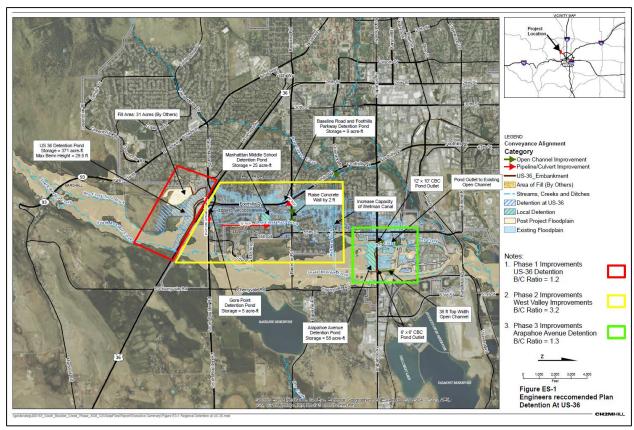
Recommended Flood Mitigation Plan Project Elements
